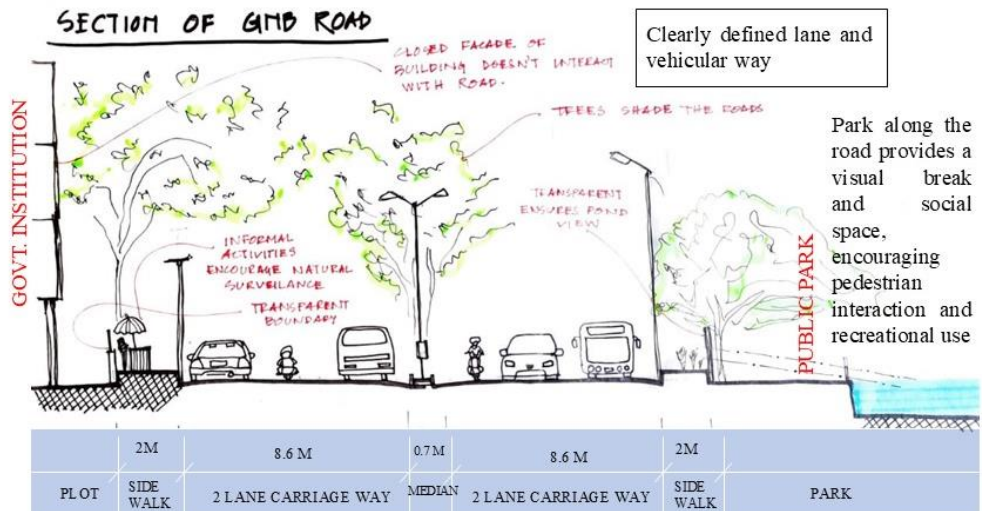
Road Section through GNB road (Uzan Bazar)
